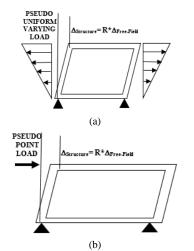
Simplified Frame Model for Deep and Shallow Tunnels/Sections
